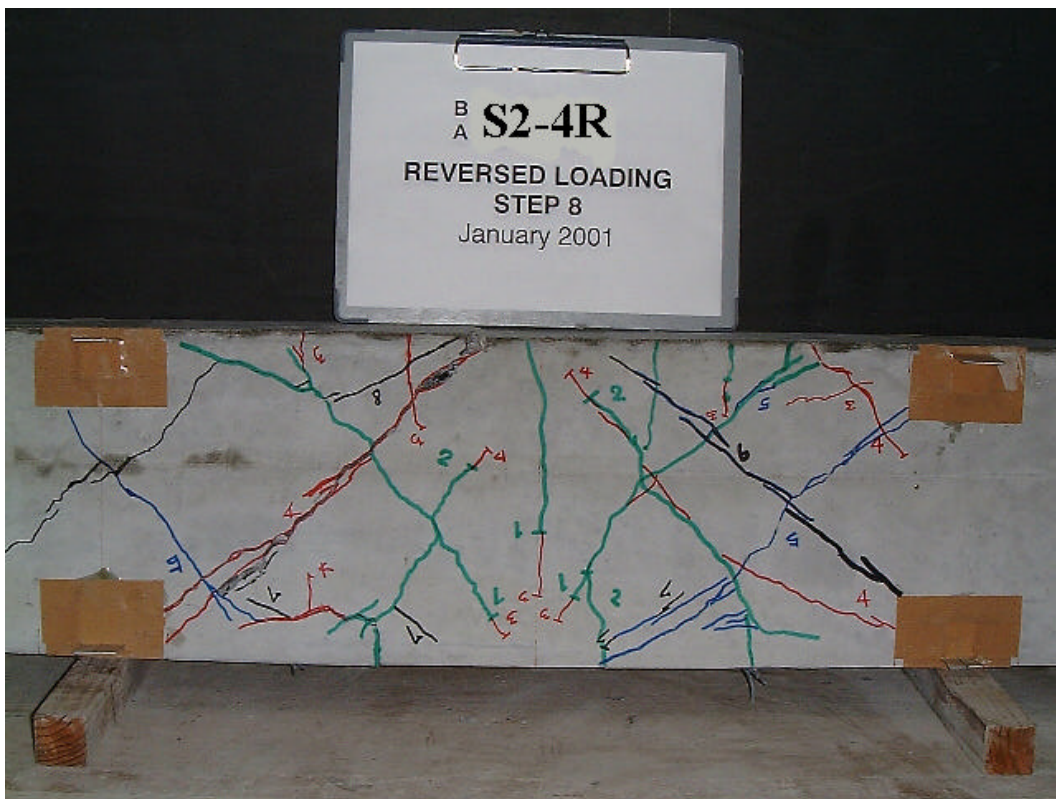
Crack Pattern of specimen S2-4R under reversed loading
